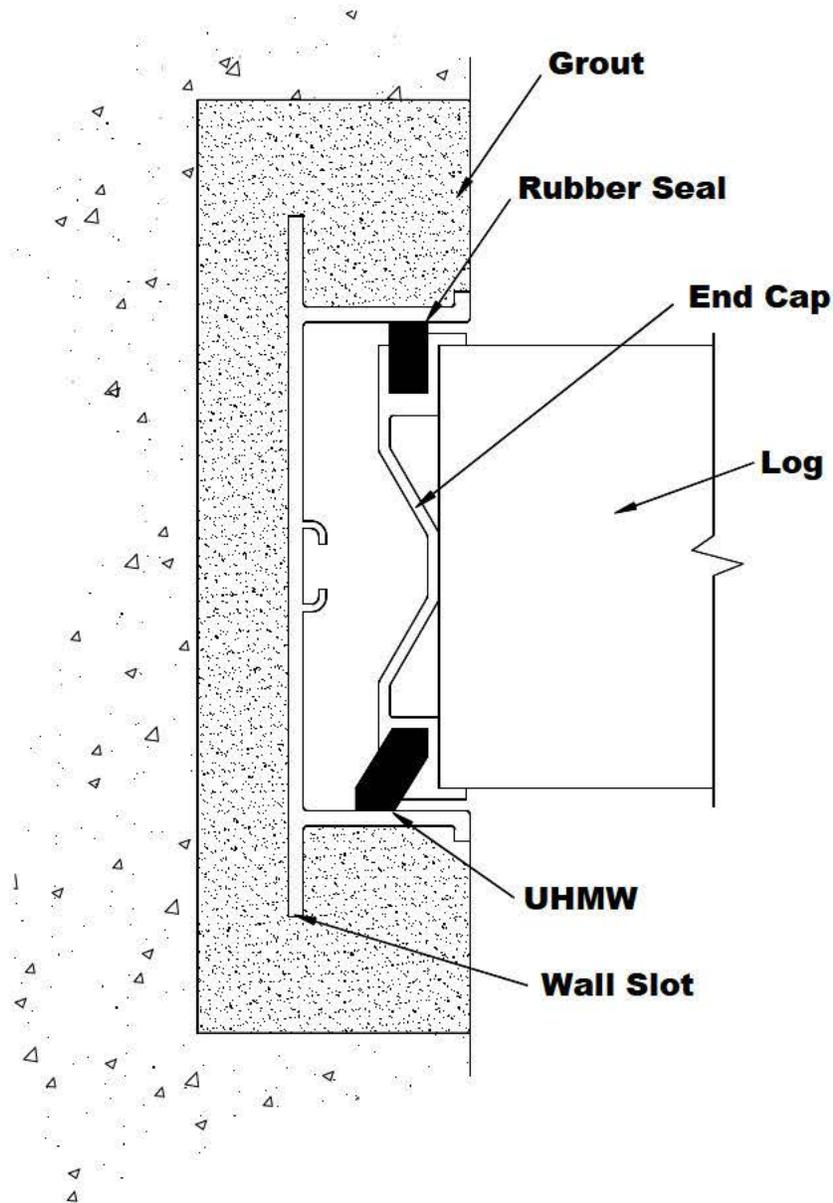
Top View of Side Wall Showing Anchor Bolts and Stop Log Guides
